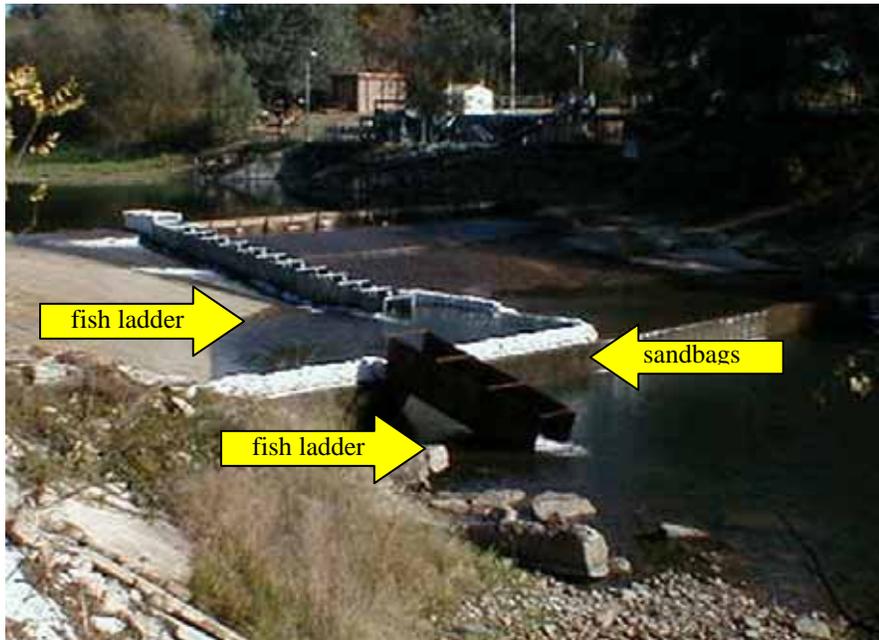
Upstream toward Bellota Weir at the left channel bank (fish ladders installed)
